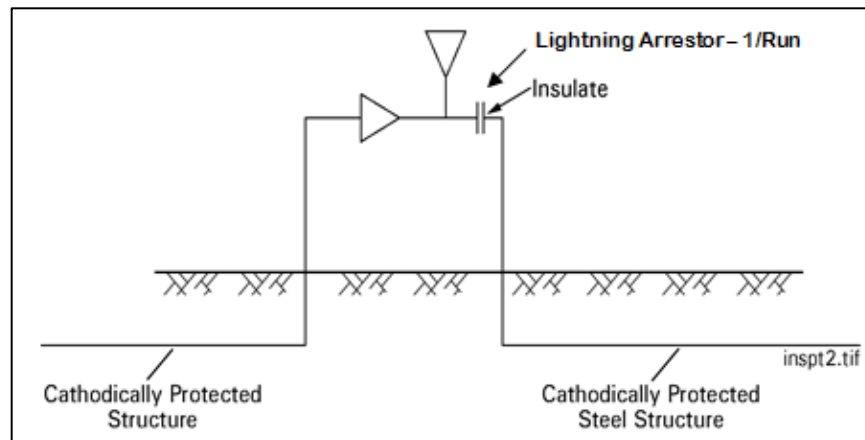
Large Distribution Station or Town Border Station with Steel Outlet System
